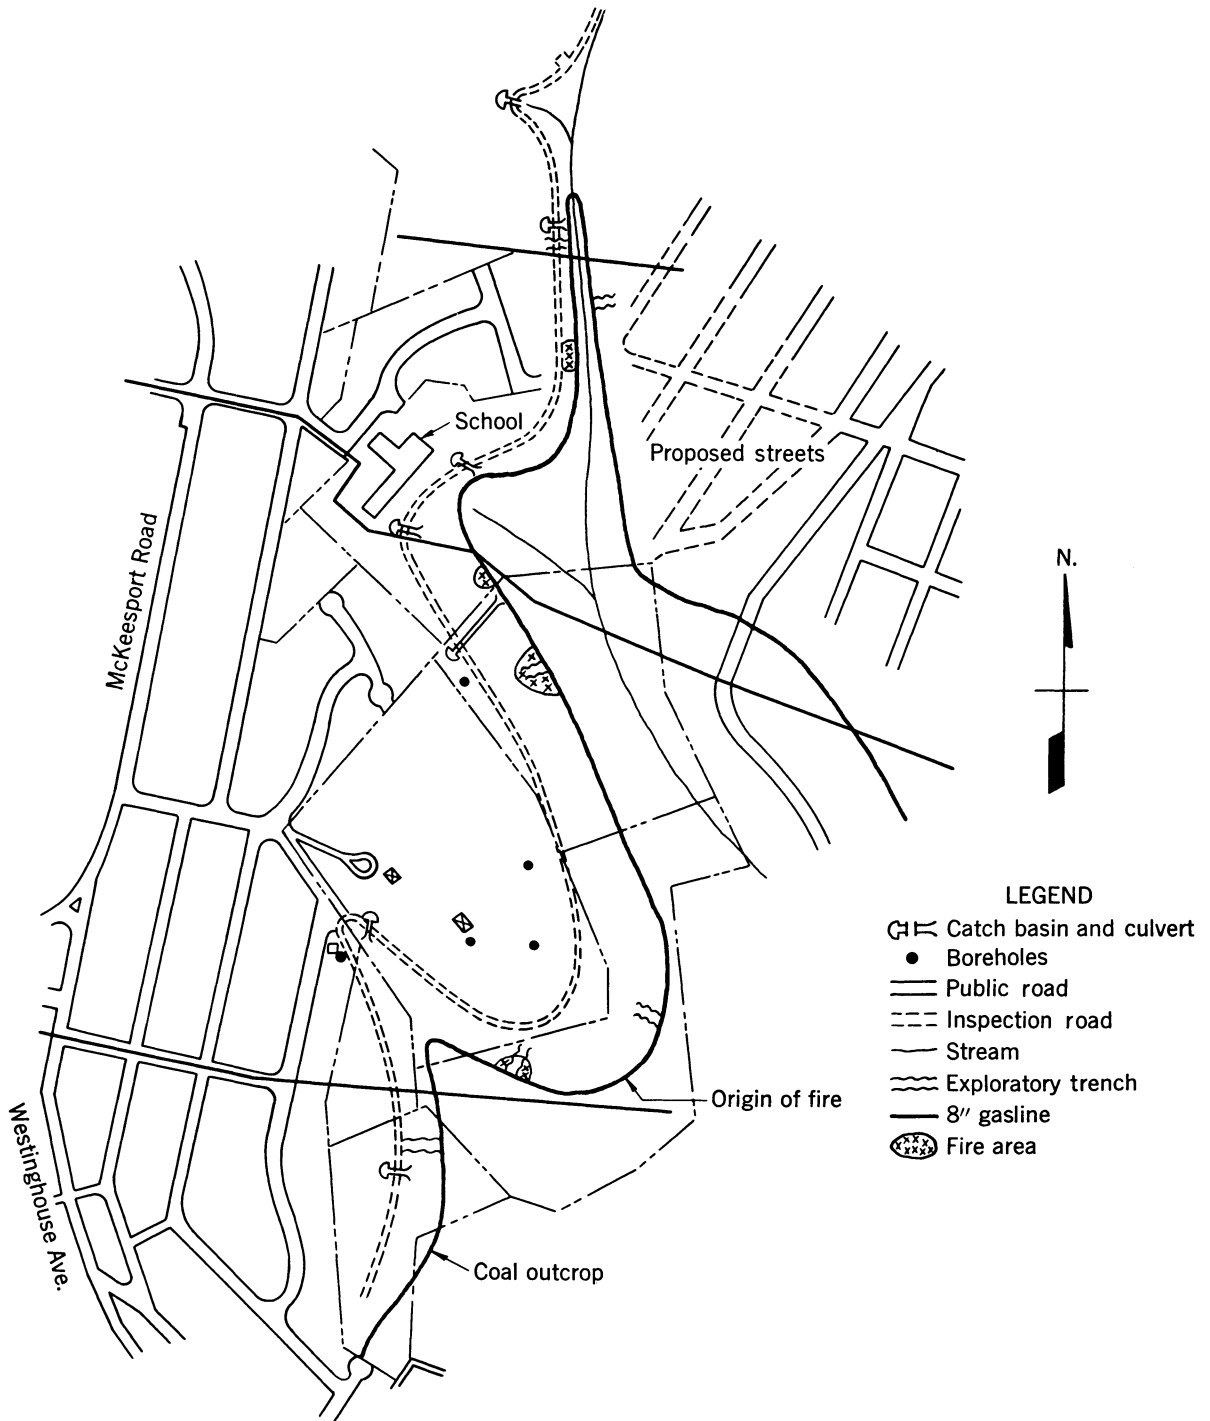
Map of Inspection Roads, Drainways, Culverts, Boreholes, and Exploratory Trenches Installed on Green Valley Fire-Control Project.
